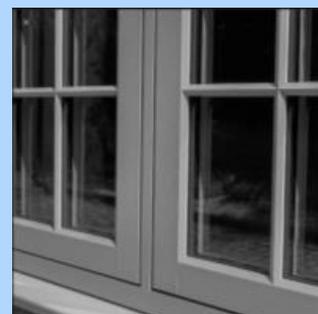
Windows are expected to have external glazing bars where glazing bars are used.
